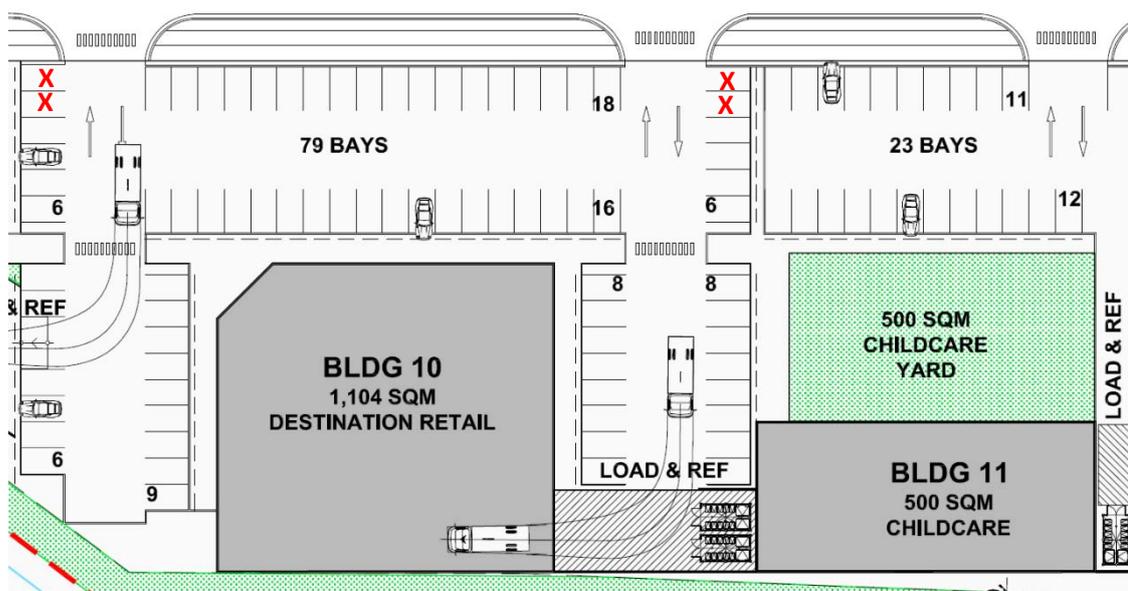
Parking Spaces to be Removed to Create Queuing Space
